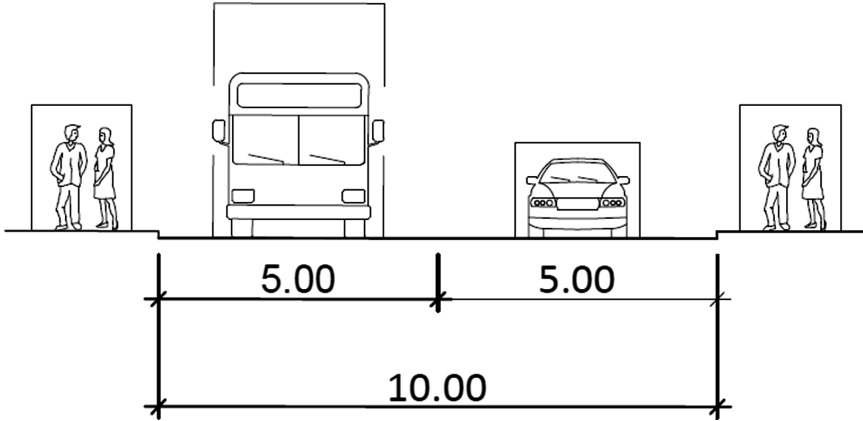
Proposal 1 – road cross-section of P.O. Hviezdoslava Street and Jilemnického Street.
